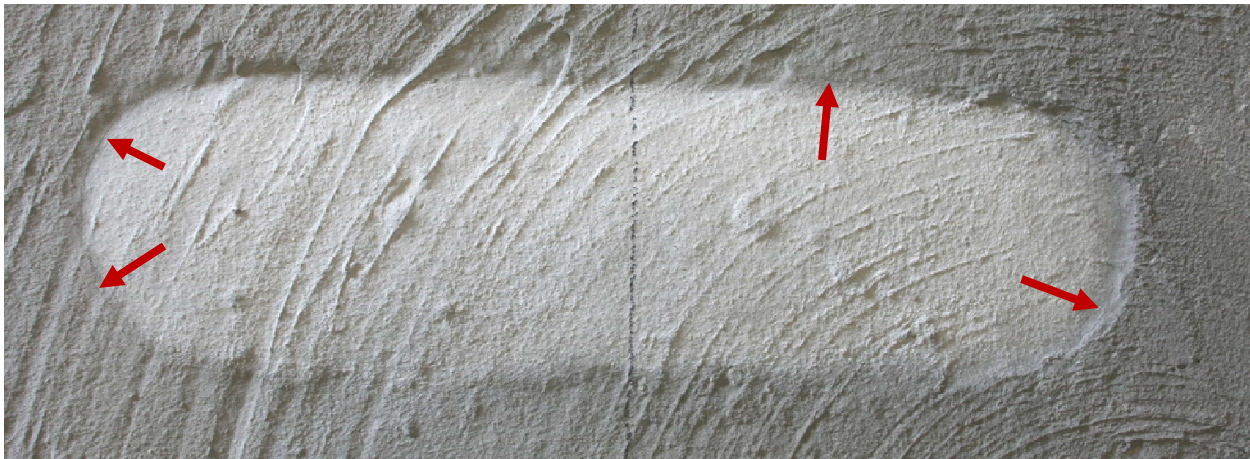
Photo. Cracking apparent on top of deck at grout pocket near west end of test specimen prior to start of structural loading.
